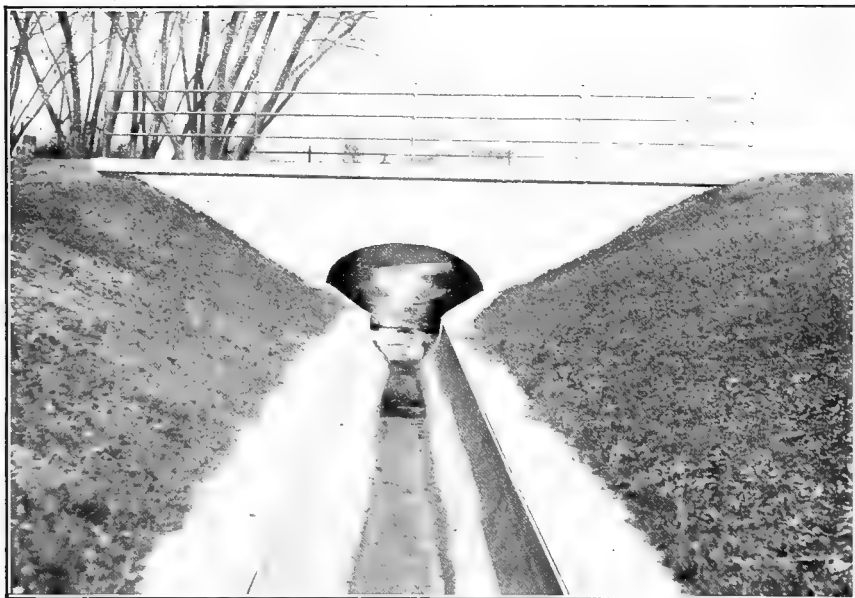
CONCRETE BROOK LINING IN NEWTON, MASS.
